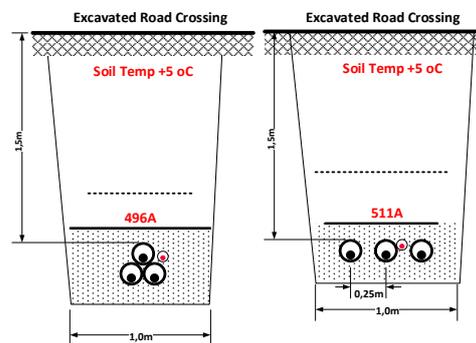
Option 3 – 66kV Cable Road Crossing Arrangement
